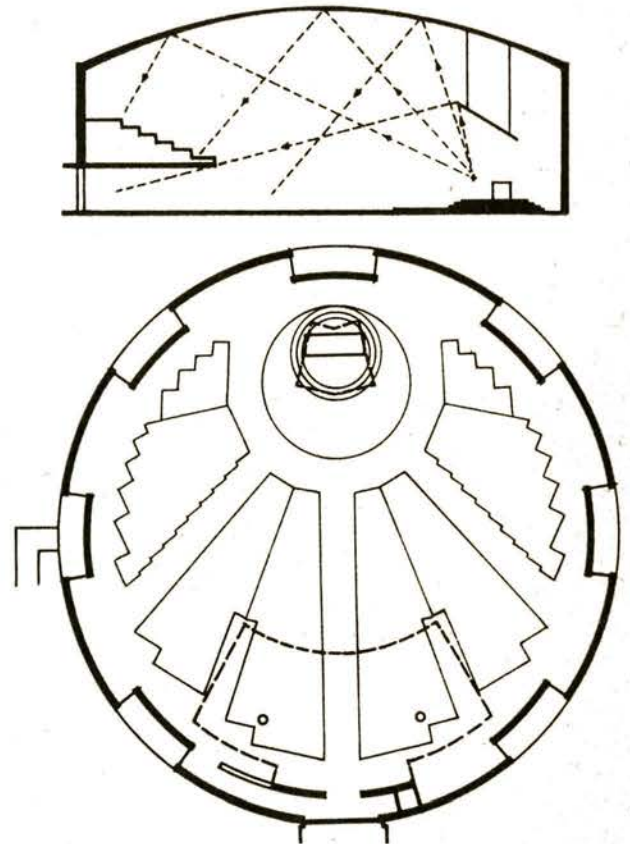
Plan and Section of St. Basil's Church, Ottawa.
